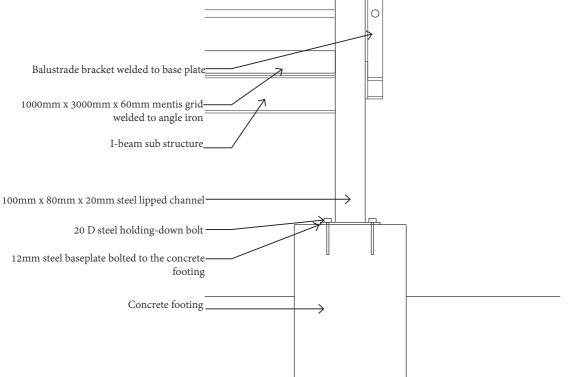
33 Detail 1 of detail E1 of viewing deck scale 1:10
